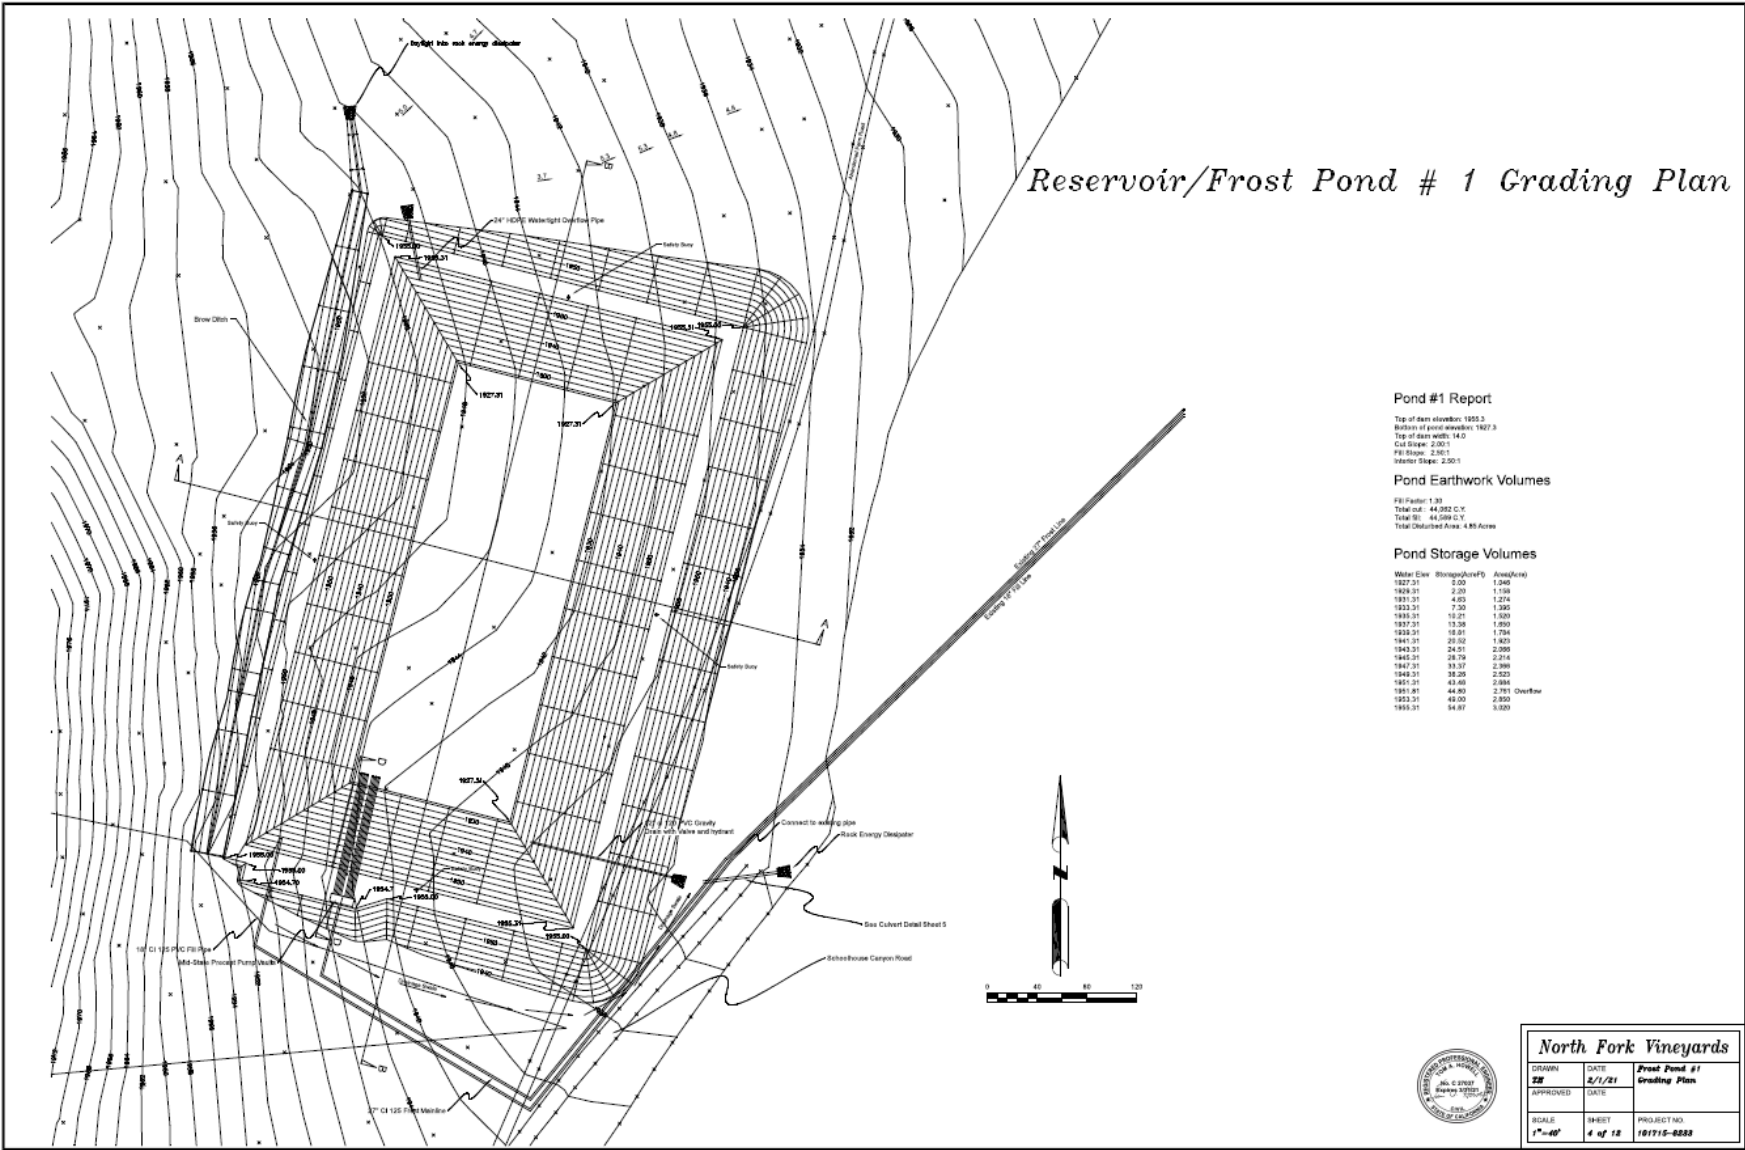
Reservoir/Frost Pond #1 Grading Plan
